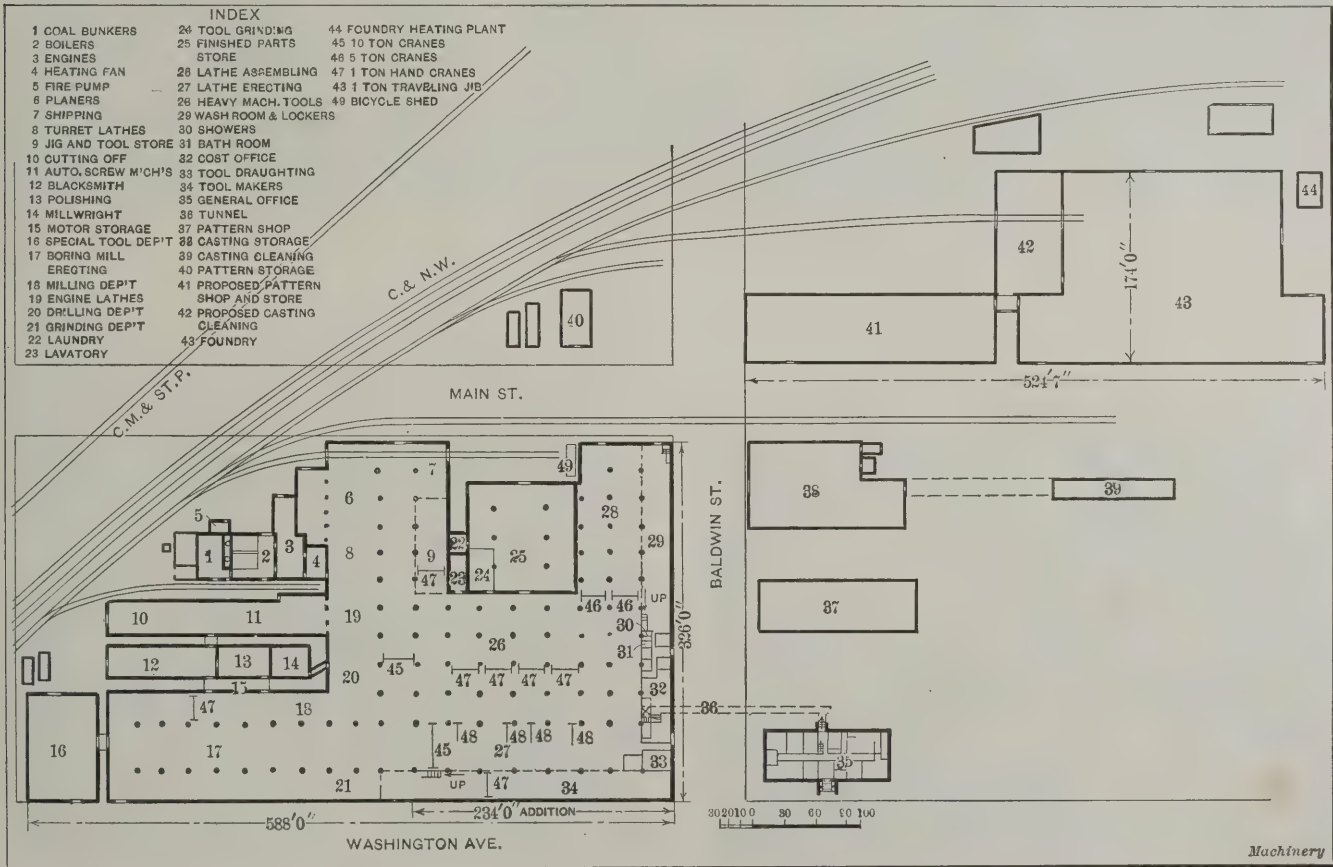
Plan showing Location of the Various Departments and Buildings, Gisholt Machine Co., Madison, Wis.
